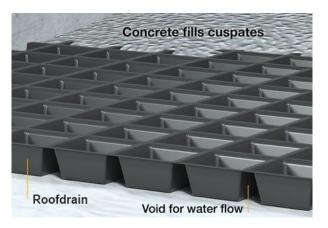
Roofdrain can be filled with mortar for construction of non-load bearing walls and beneath planters.
